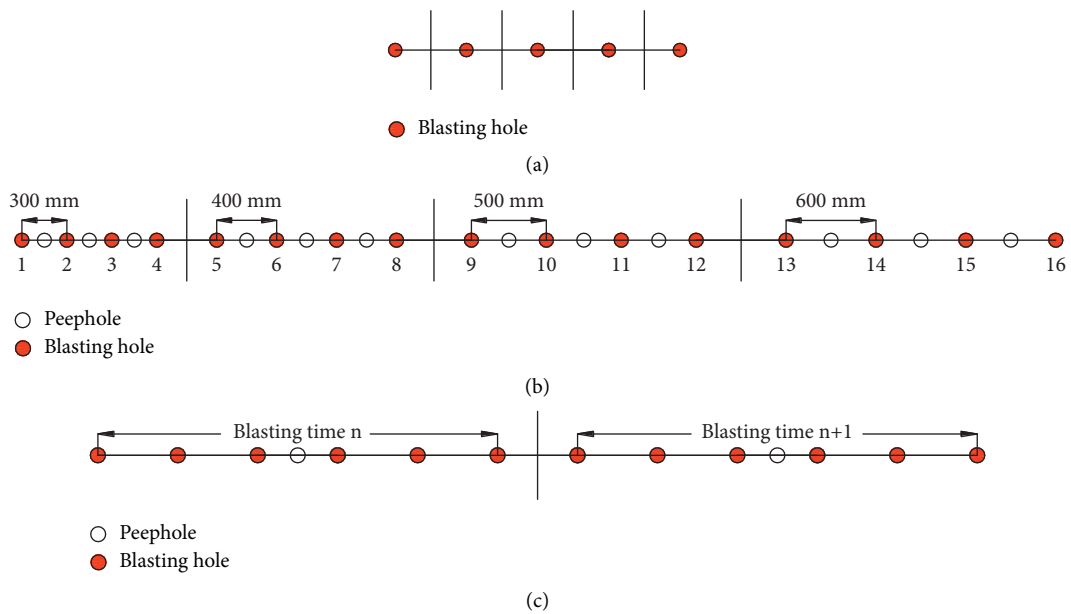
Holes layout in blasting test. (a) Single-hole blasting test. (b) Interval-hole blasting test. (c) Continuous-hole blasting test.
